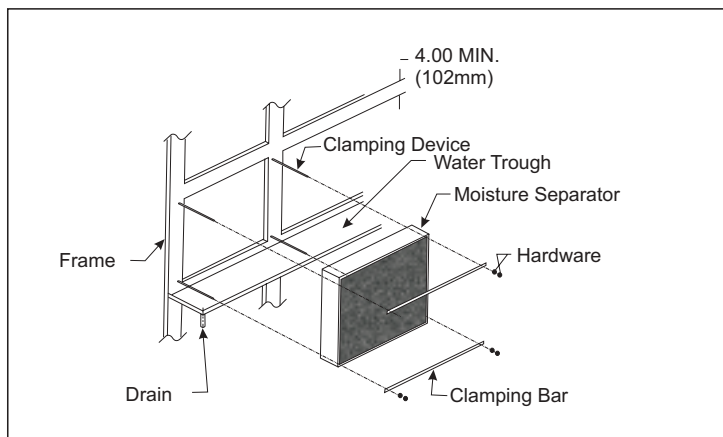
Typical Moisture Separator and Mounting Frame
